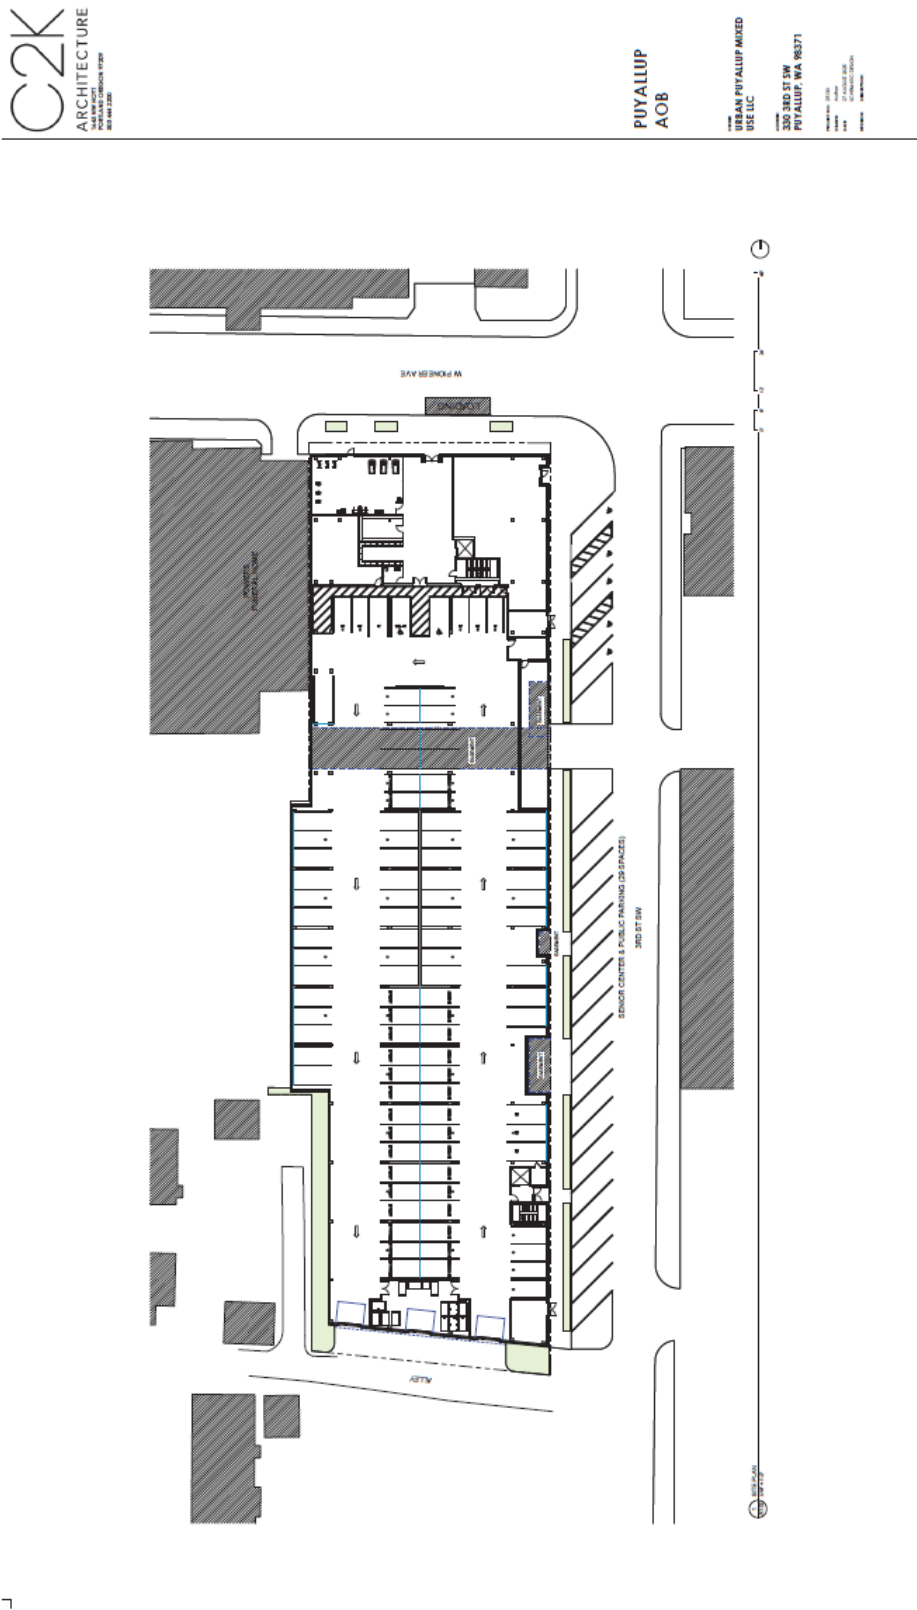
B. PRELIMINARY SITE PLAN – PUYALLUP AOB
